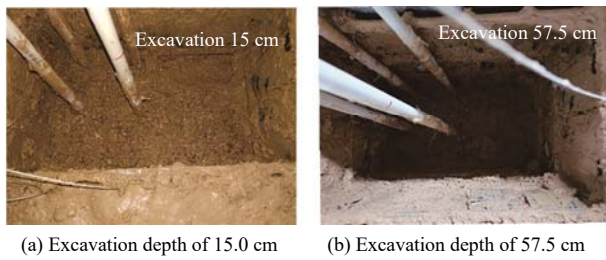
Dewatering and excavation of the foundation pit with prefabricated recyclable support structure
